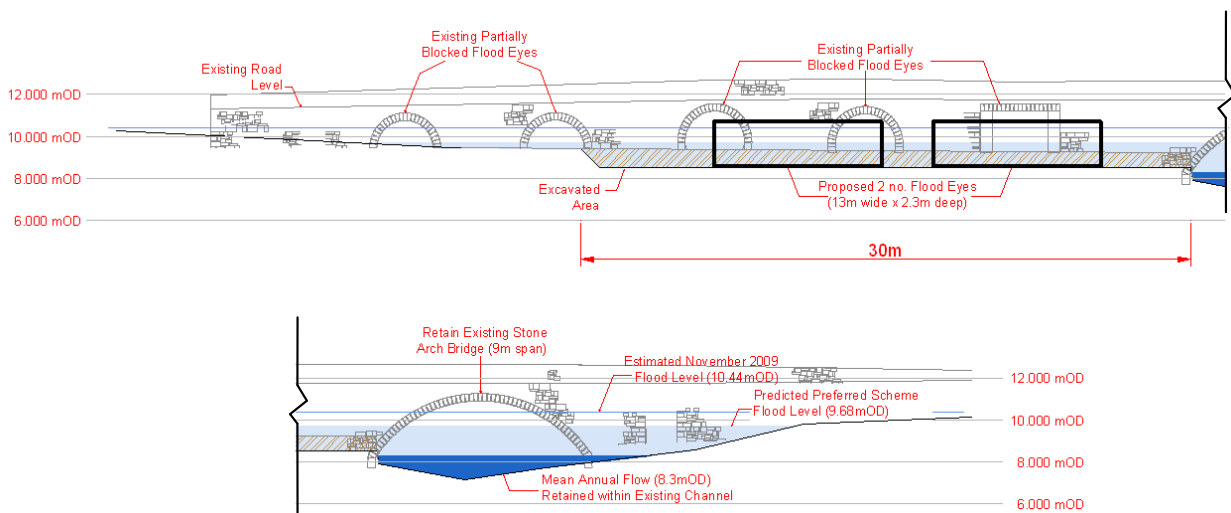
Proposed Works at Killeely Beg Bridge
